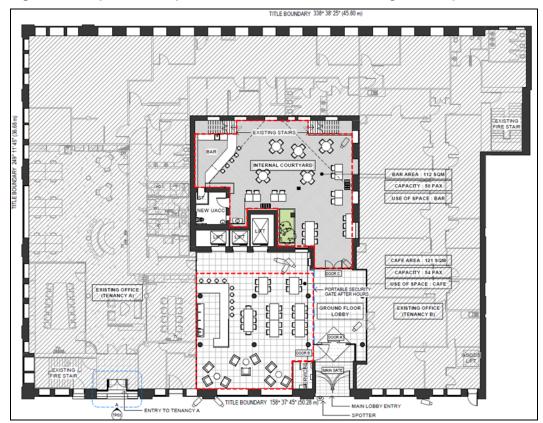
Proposed floor plan for the bar and café, including red line plan
